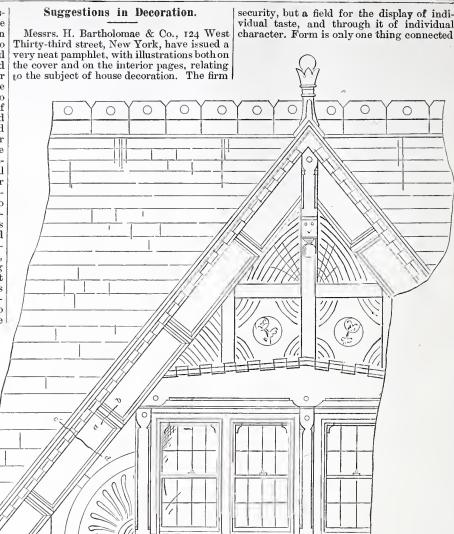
Part Elevation of Principal Windows.—Scale, ½ Inch to the Foot.
